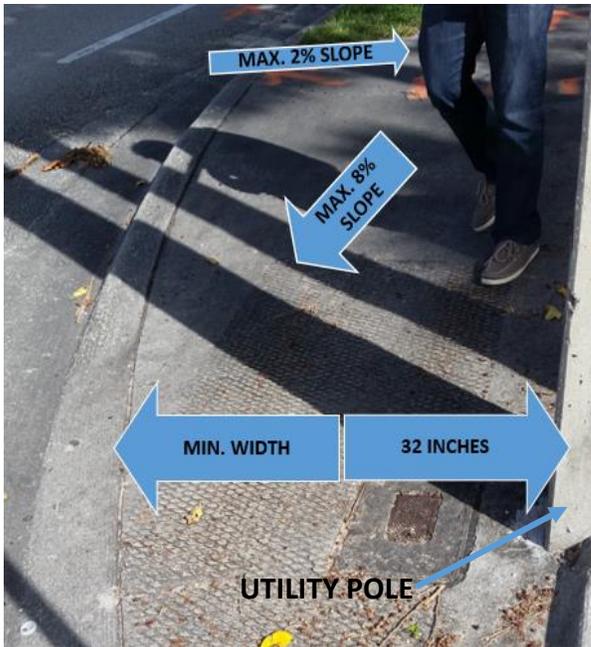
Curb Ramp Criteria at a Point Obstruction
